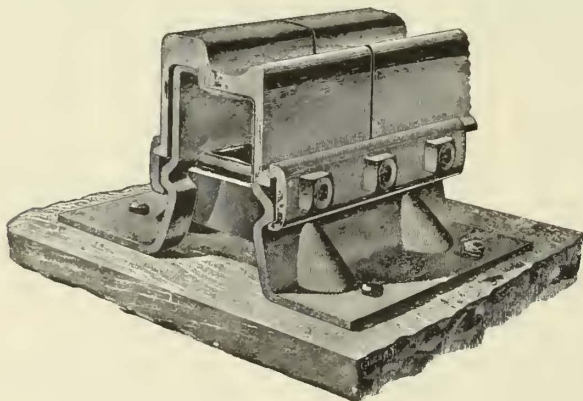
JOINT CHAIR FOR BOX GIRDER.
